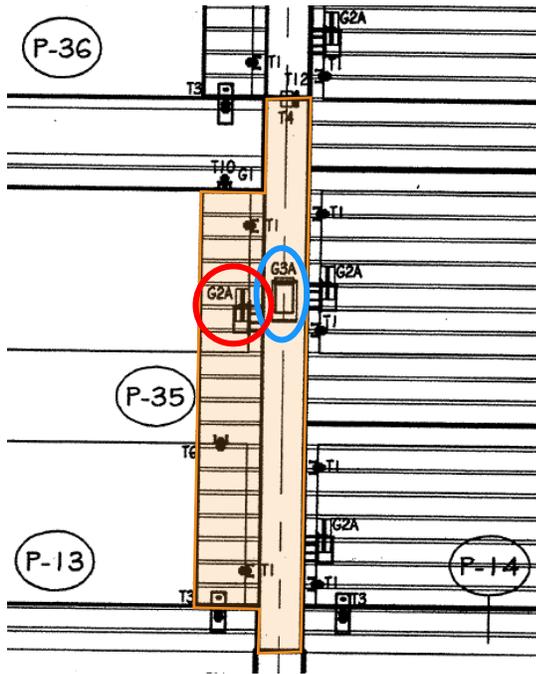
Original drawing elevation of the facade panel (shaded and outlined in orange) with missing vertical support (circled in red) observed at Level 5 Column PD/P1. The blue oval indicates the other vertical support for this facade panel piece.
